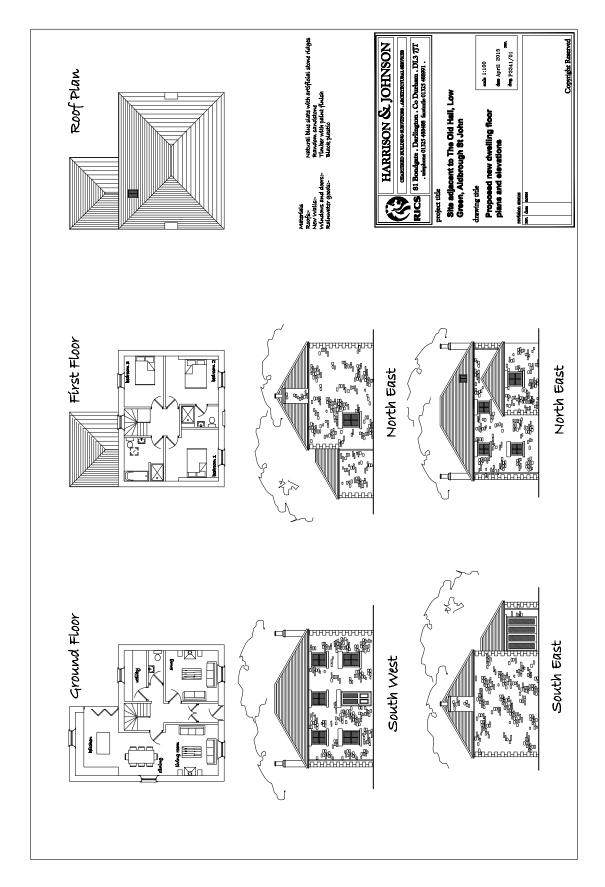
Proposed floor plans and elevations (illustration prepared by Harrison and Johnson Architects)
